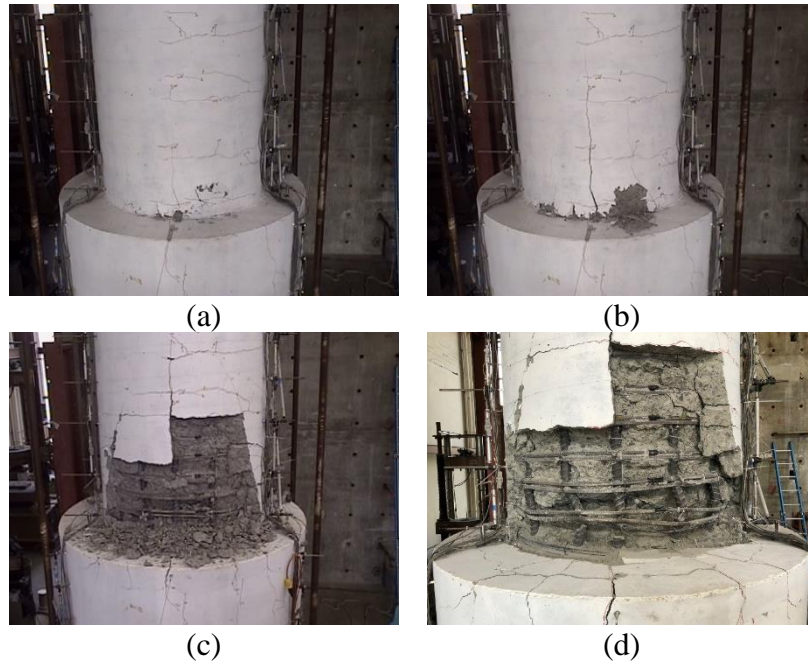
South Face of Column Plastic Hinge at Key Points During Test; (a) Concrete Flaking; (b) Concrete Spalling; (c) Bar Buckling Exposed; (d) Severe Bar Fracture
